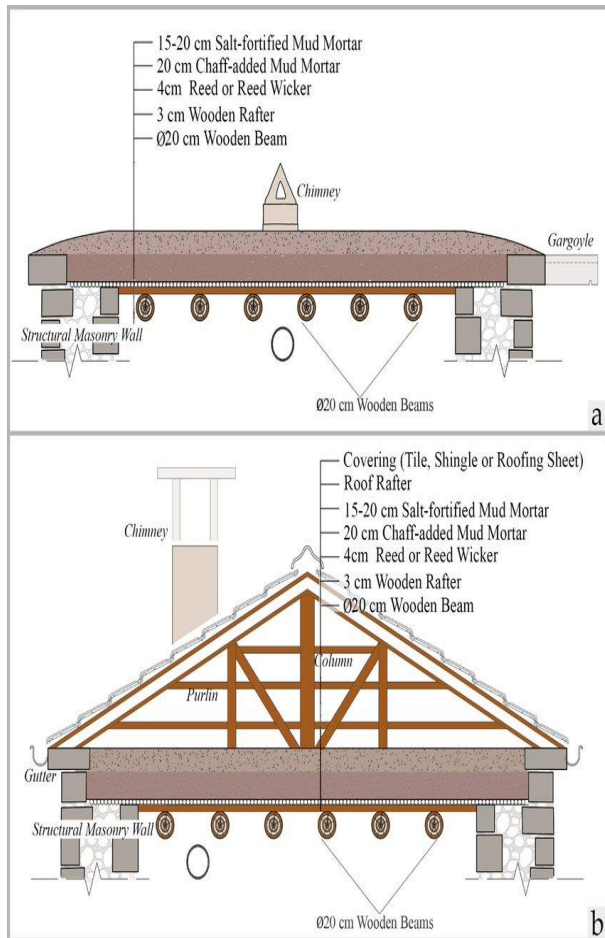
Different typologies of constructed earthen roofs; a) Flat earthen roofs b) Earthen roofs with roof rafters
